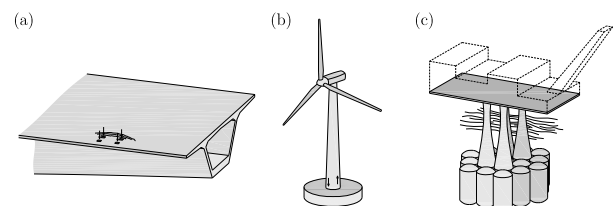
Examples of structural elements potentially sensitive to shear fatigue failures: (a) bridge deck slabs; (b) wind towers; and (c) offshore platforms.
